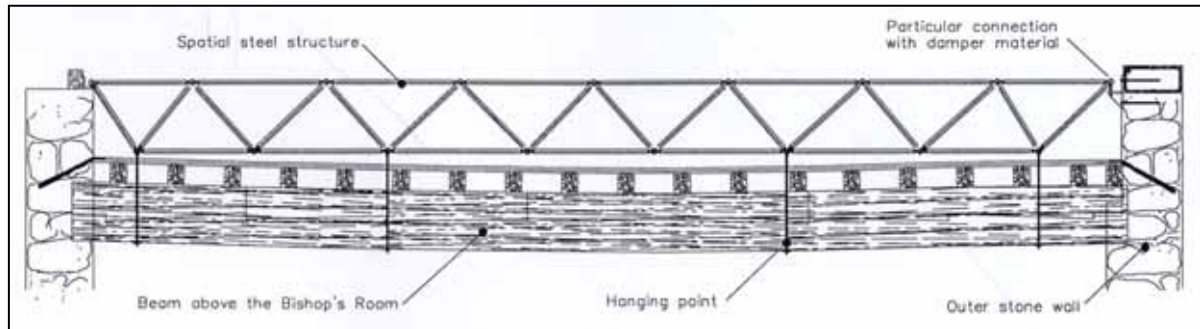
The reticulate spatial steel structure over the Bishop's Room
